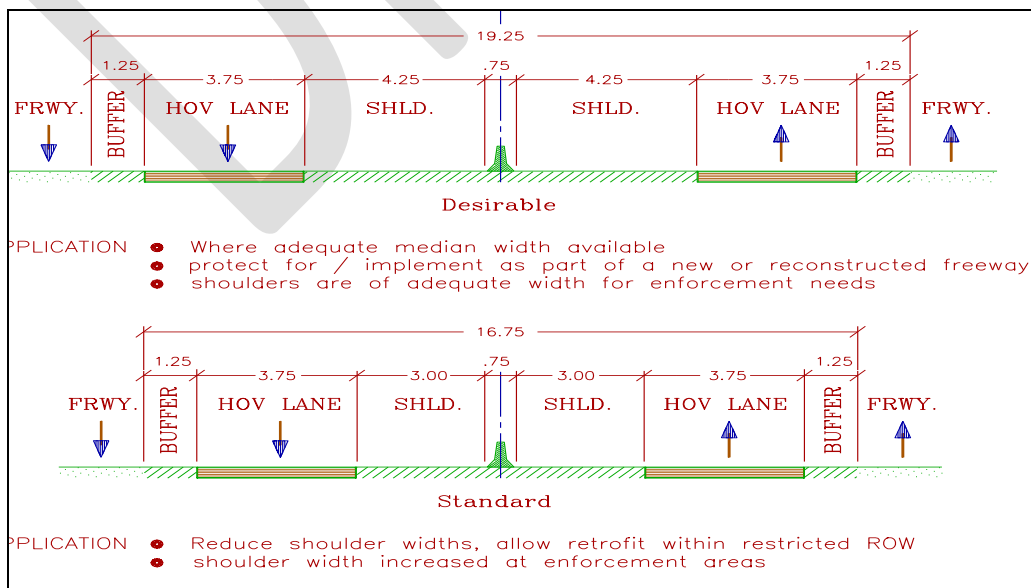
Two-Way Buffer-Separated HOV Facility Cross-Sections
